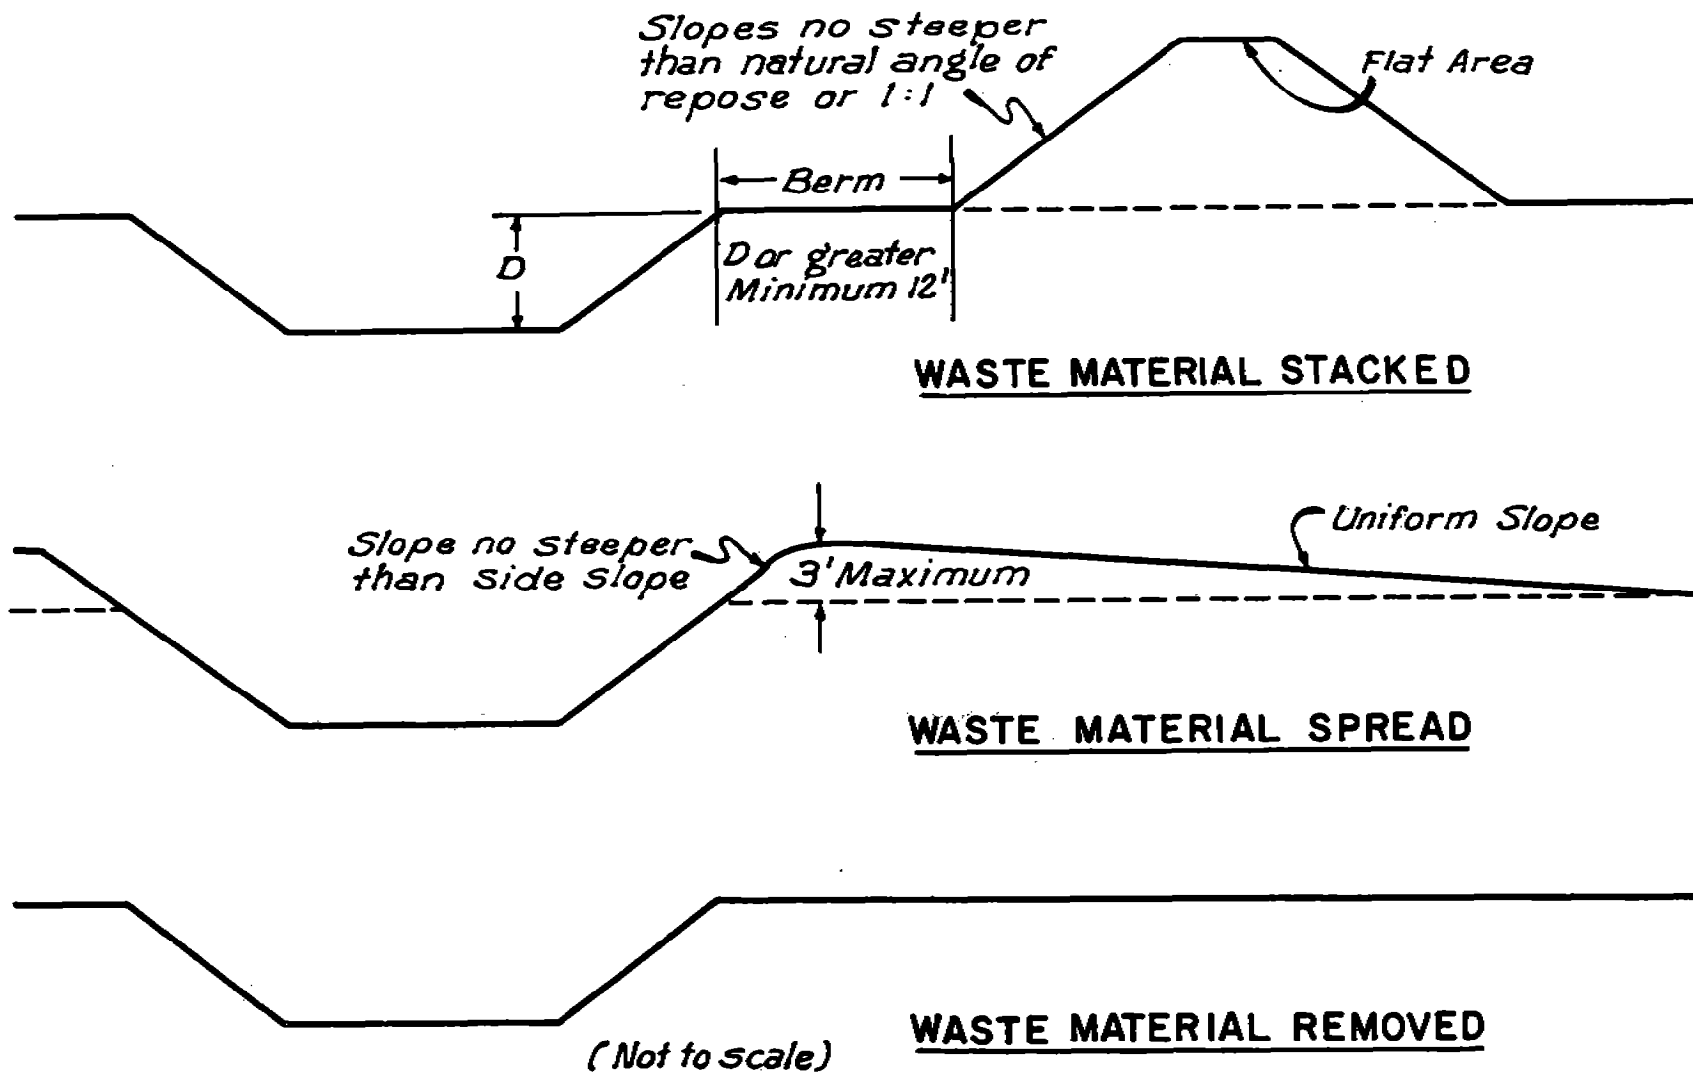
Cross sections of excavated pond showing methods of waste material disposal.
